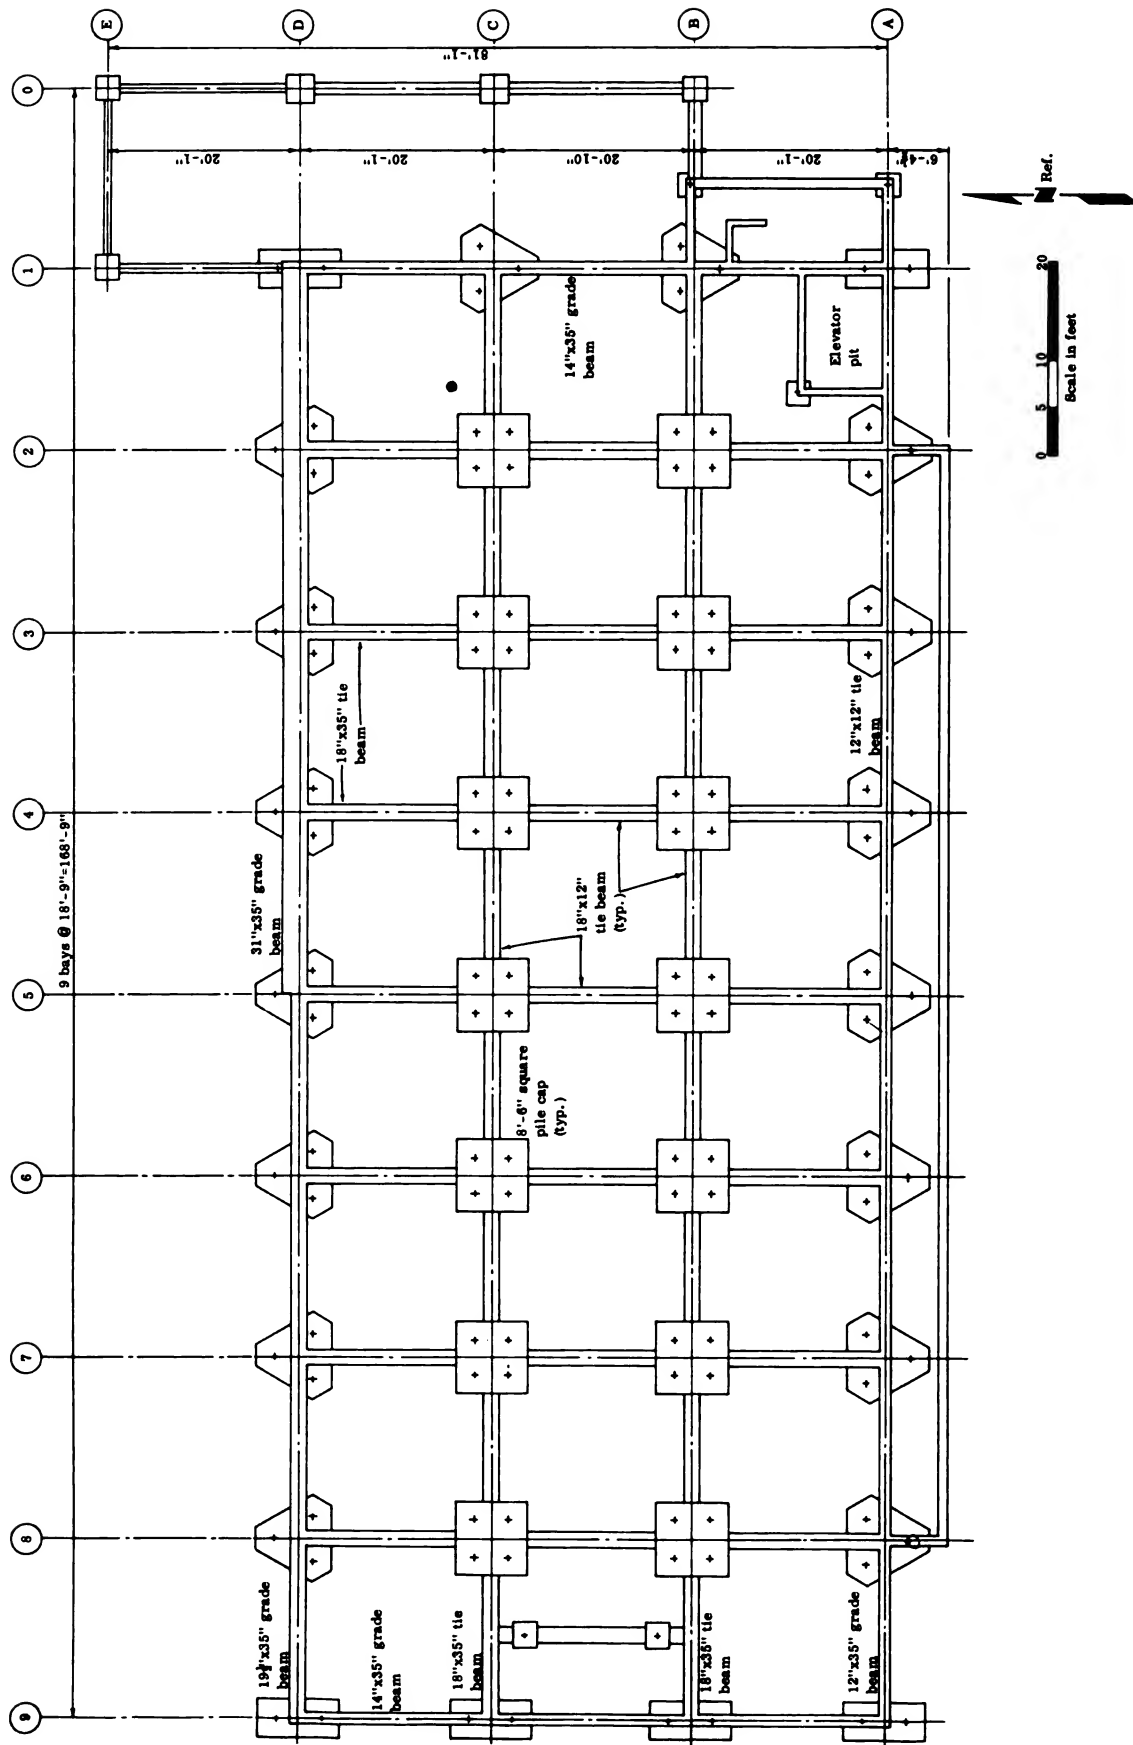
Holiday Inn, Marengo Street. Foundation plan.
